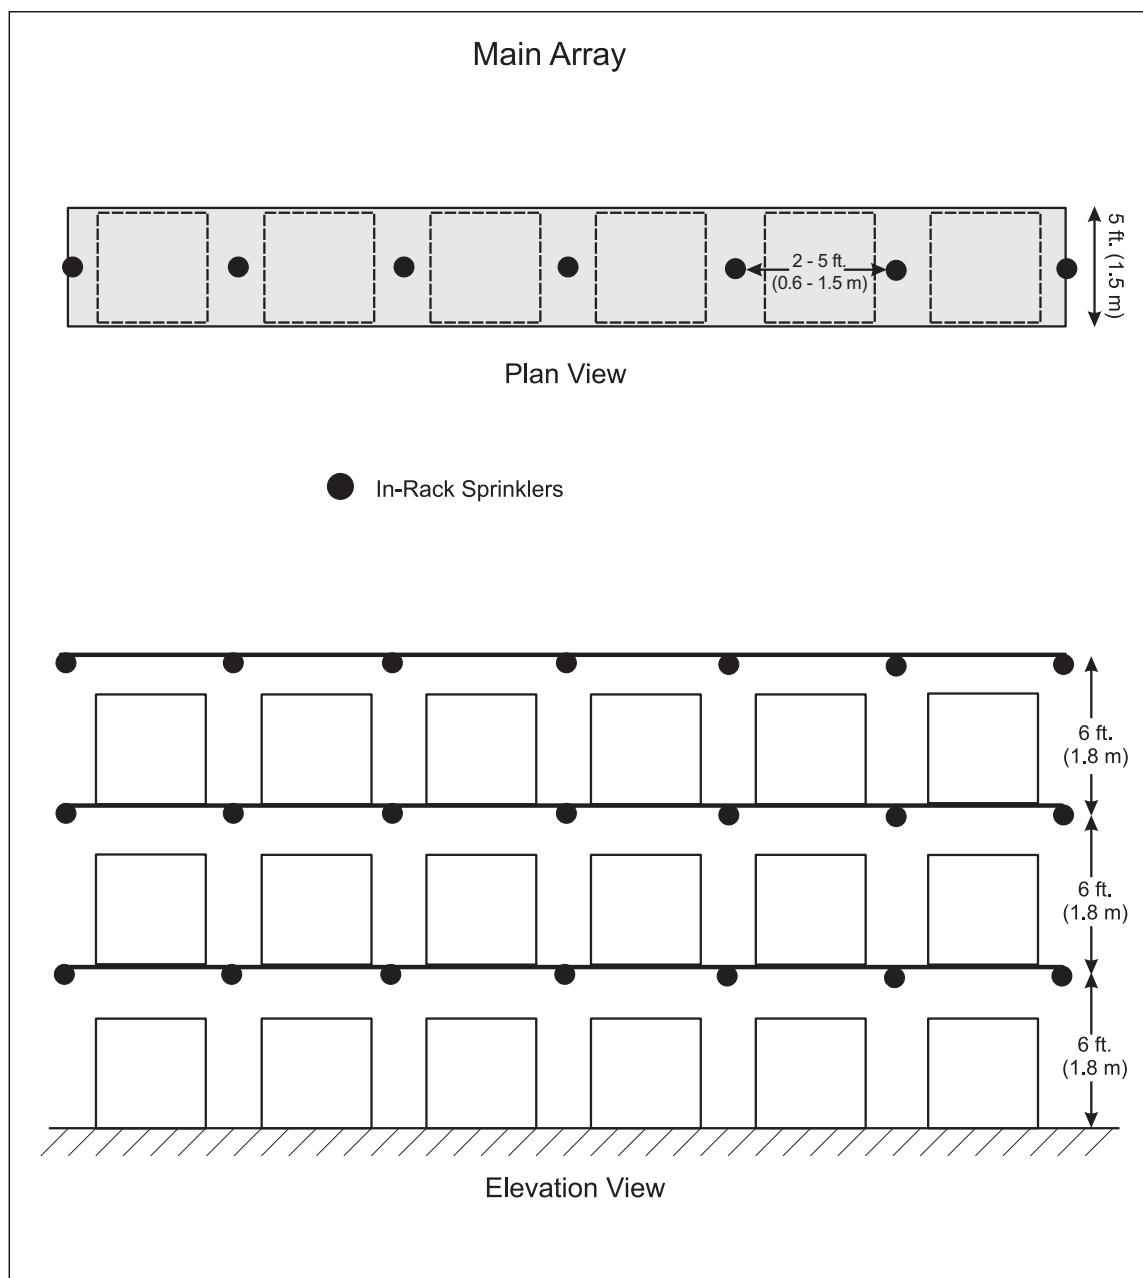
Single-row rack sprinkler layout: fire protection scheme D
